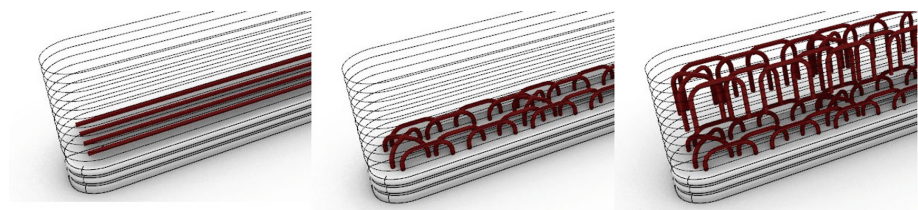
Testing samples (Left to right): Continuous R, Staple R. Bottom, Staple R. Top + Bottom
